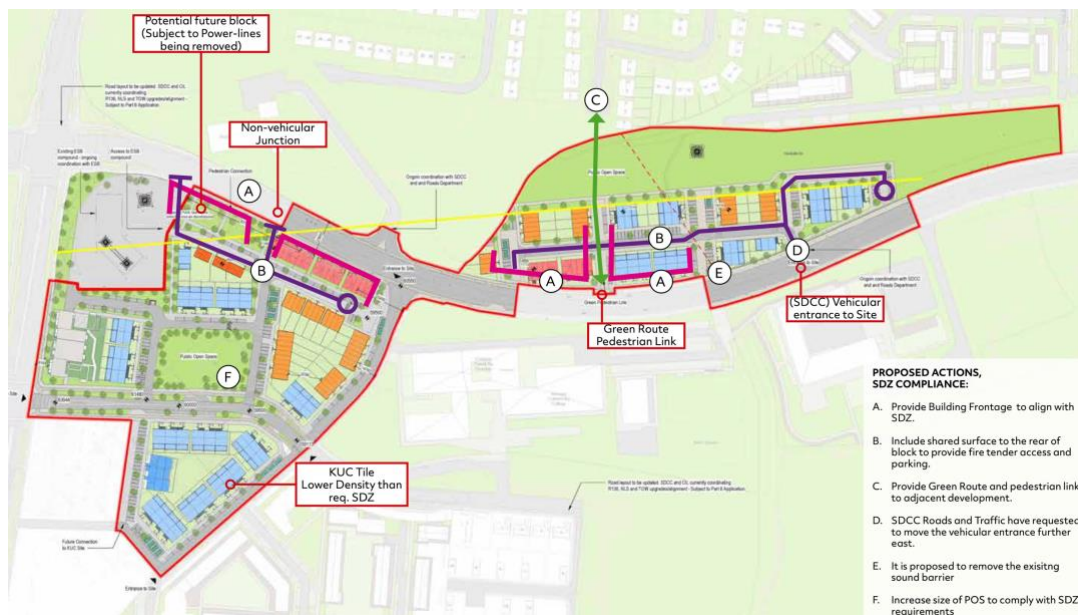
Site Layout Plan (Site 5) at Section 247 meeting held on the 18 June 2024 with application areas outlined in red
